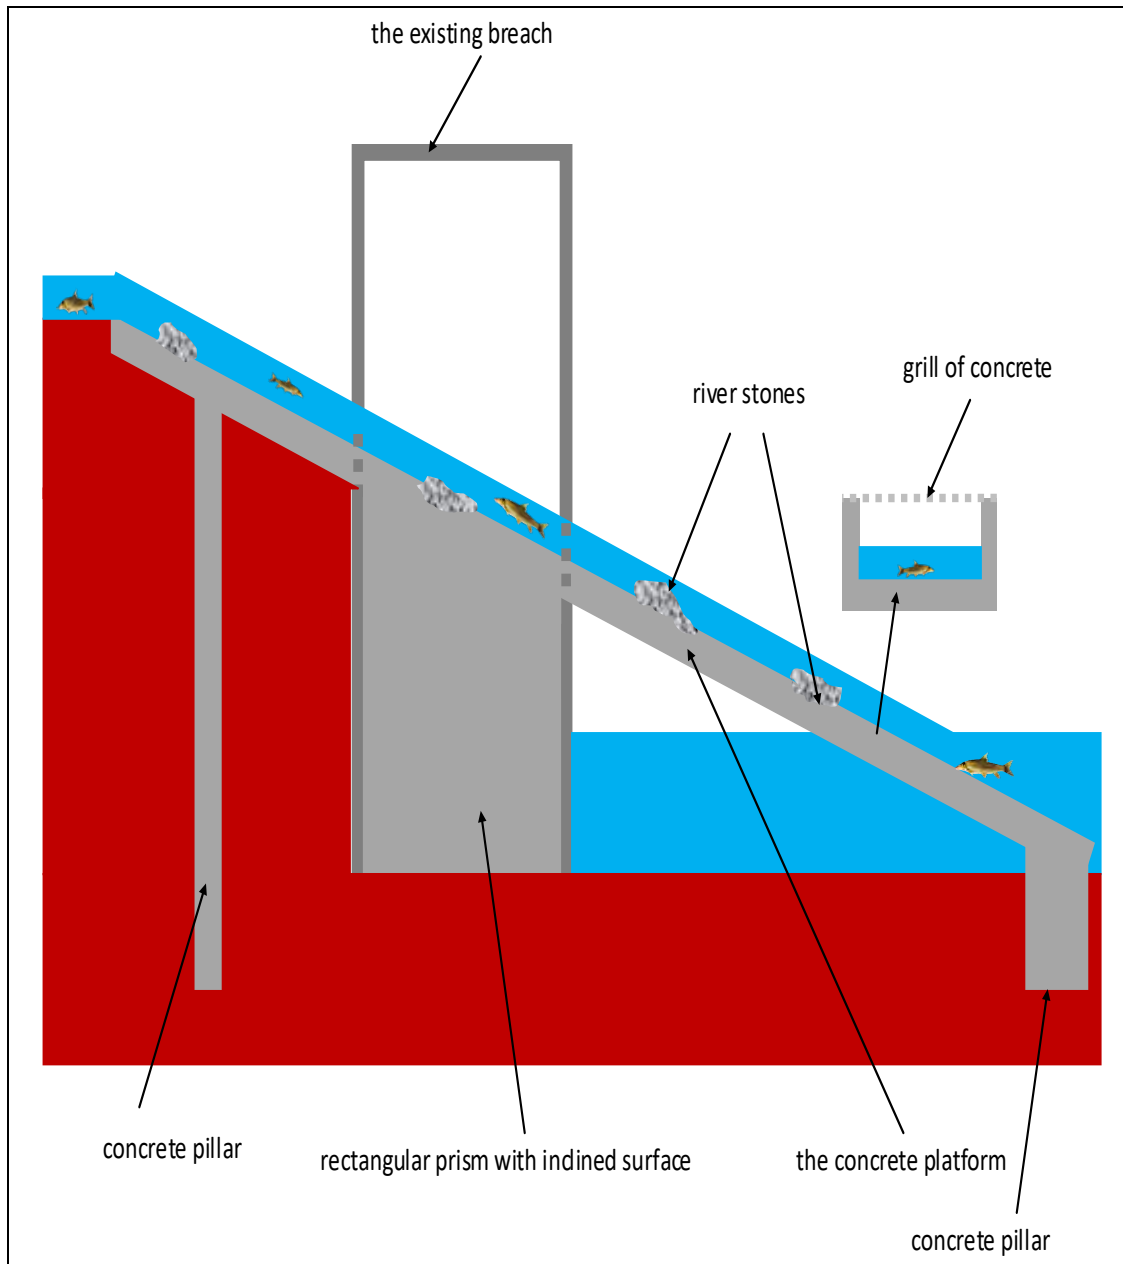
Positioning of the concrete platform upstream and downstream of the discharge sill 5 – indicative scheme.
